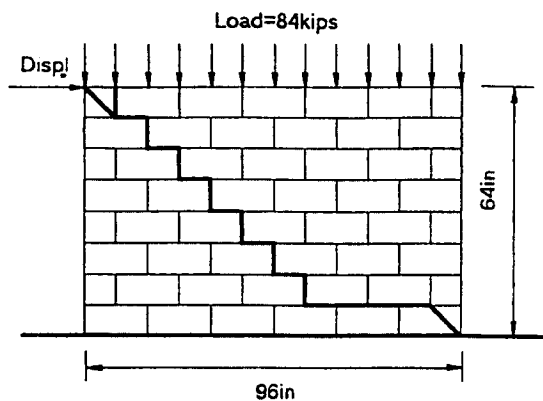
Experimental cracking pattern of URM wall (Woodward and Rankin 1984)
